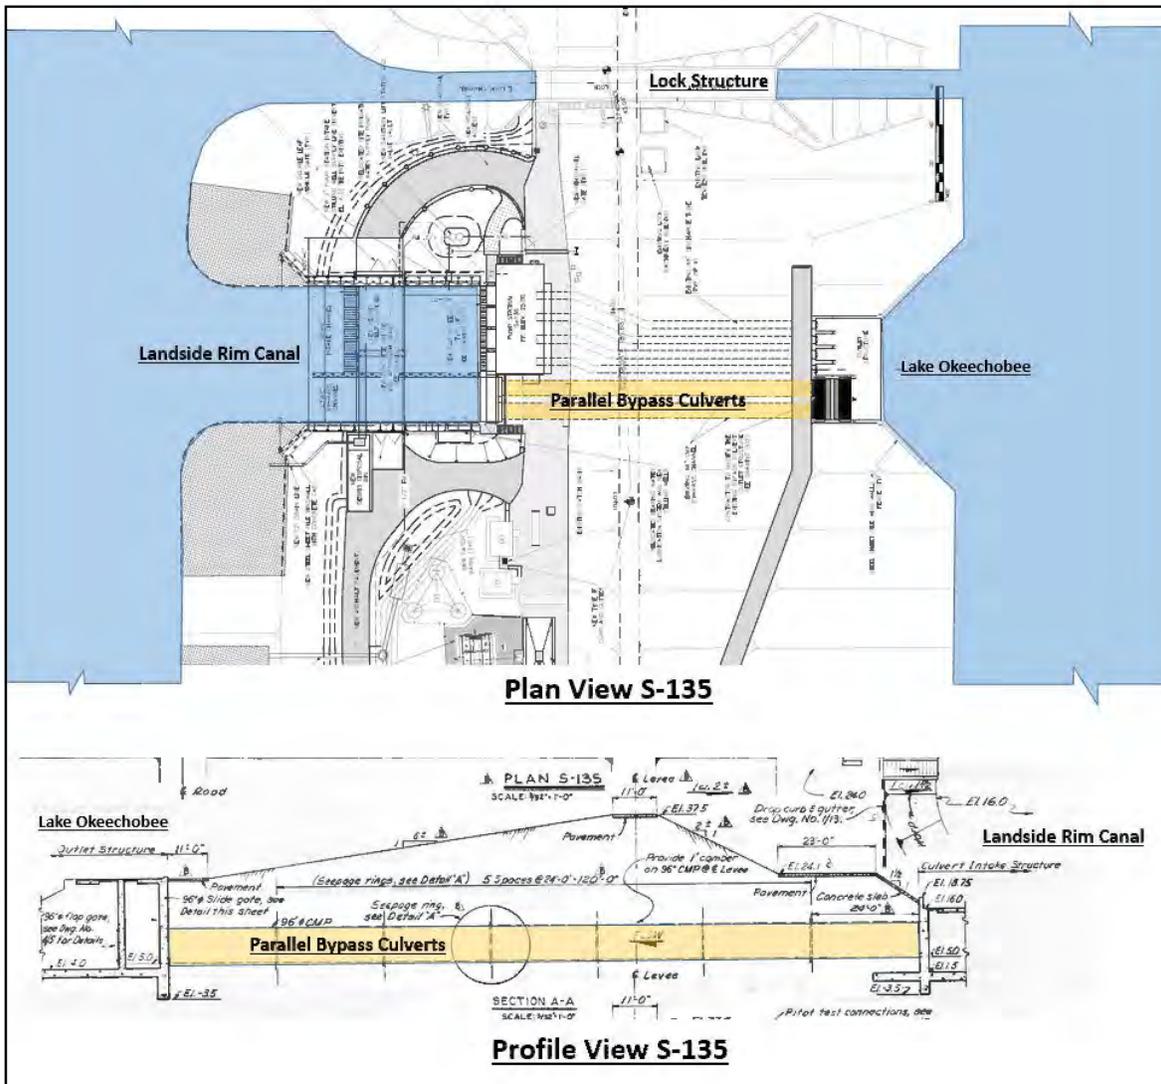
S-135 Site Plan (note plan and profile views from the as-builts are reversed, with Lake Okeechobee presented on opposite sides)
